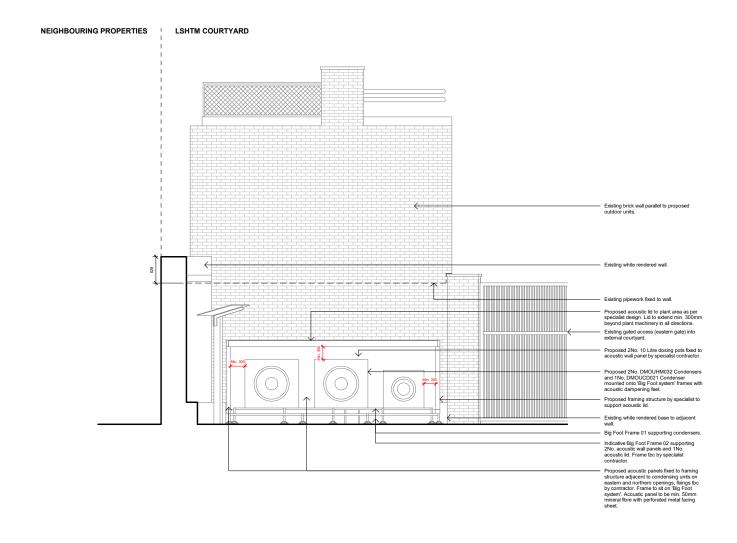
Elevation (not to scale) looking east and the perimeter wall, the condensers neatly stacked ahead of it.
